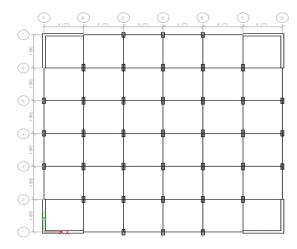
Model 3 (Building with "L" shaped shear wall)
